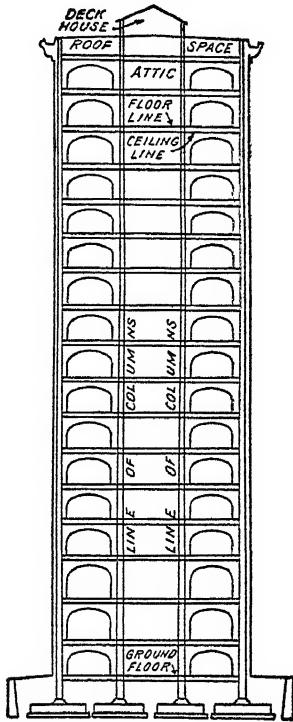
PORTAL TYPE OF WIND BRACING—SECTION.
